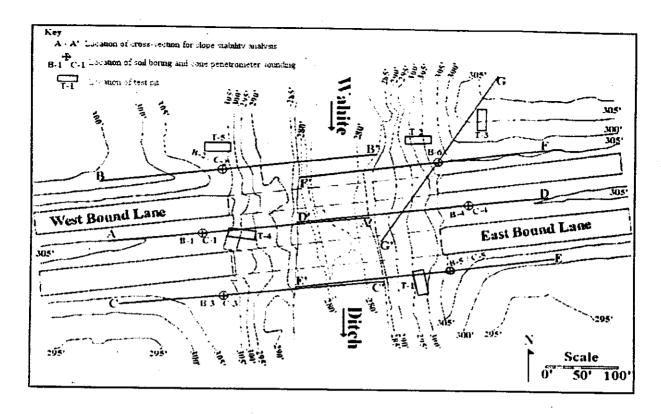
Wahite Ditch Site Topography, Cross-Sections and Boring Locations
